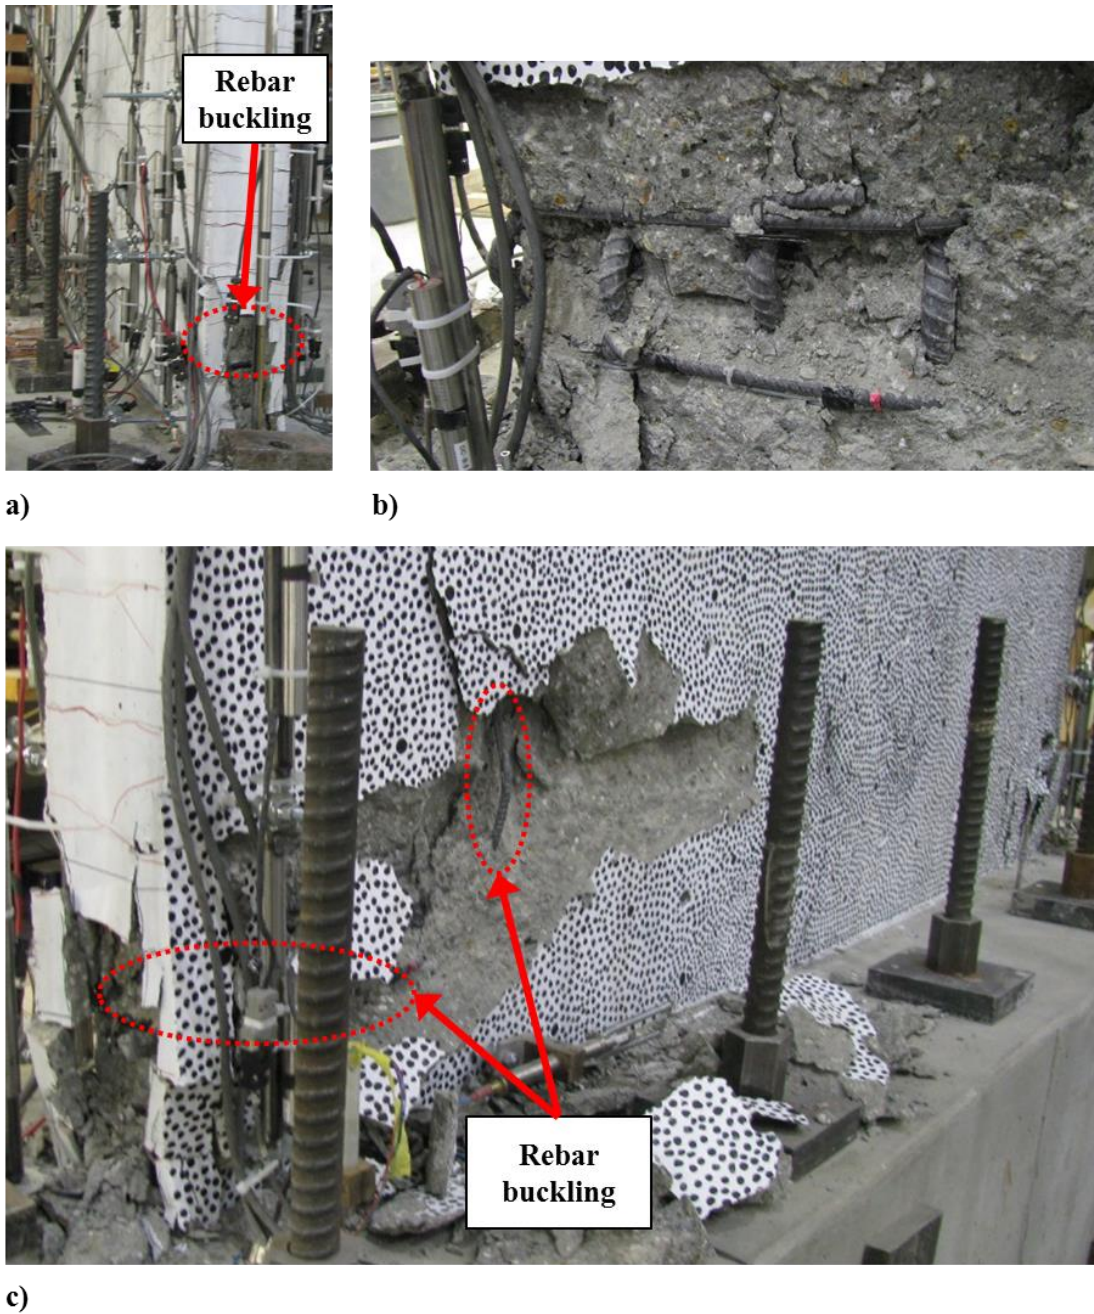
Specimen WP3 damage progression at west boundary – a) Concrete crushing/spalling and slight buckling of reinforcement at west edge of wall (+1.5% rotation, cycle 2); b) Buckling of No. 5 longitudinal reinforcement at west boundary (+1.5% rotation, cycle 3); and c) Boundary and web crushing and longitudinal reinforcement buckling (+1.5% rotation, cycle 3)
